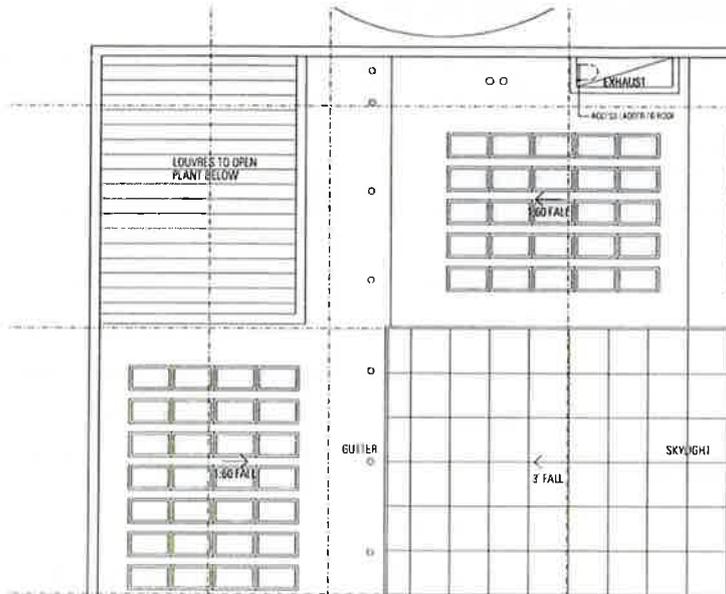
ROOF PLAN (NORTH WEST CORNER) AS APPROVED UNDER SSD 7894
